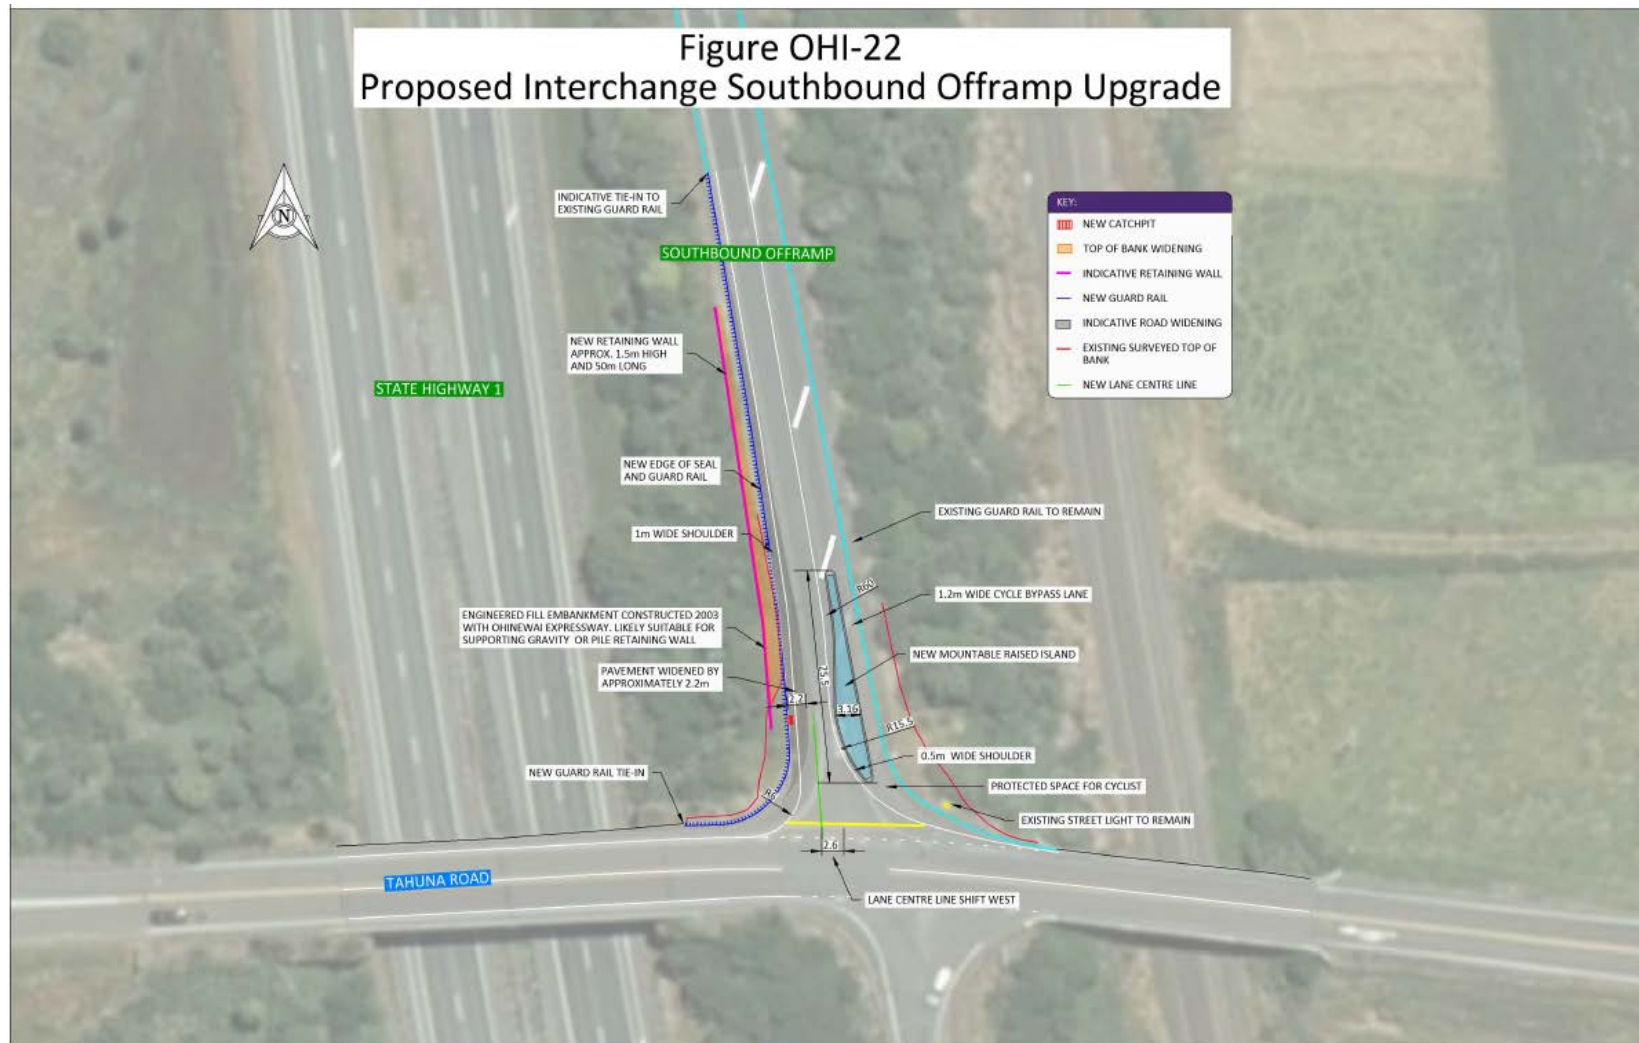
Ohinewai Structure Plan – Proposed Ohinewai Interchange Southbound Offramp Upgrade.
